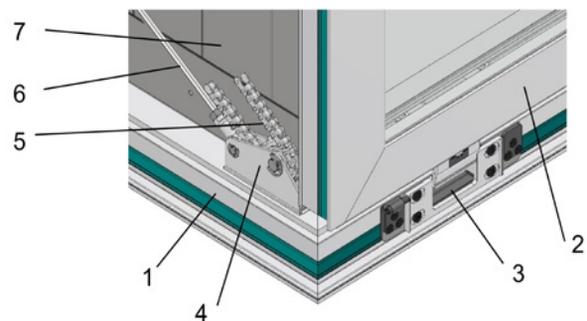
Cable chain and rod grip in the bottom sash: 1 – bottom sash; 2 – top sash; 3 – hinge; 4 – cable chain and rod grip; 5 – cable chain (fragment); 6 – articulated rigid rod; 7 – balustrade infill
